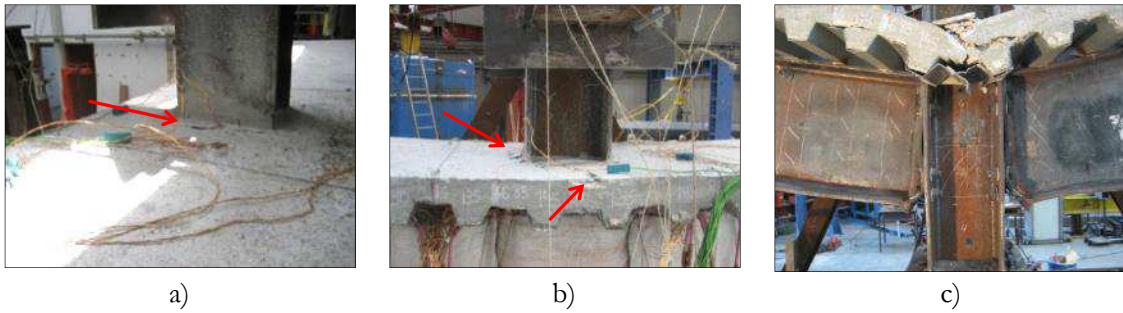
Concrete crushed: a) against the column flanges; b) along the entire slab width; c) at the end of the test (front view of test 6)
